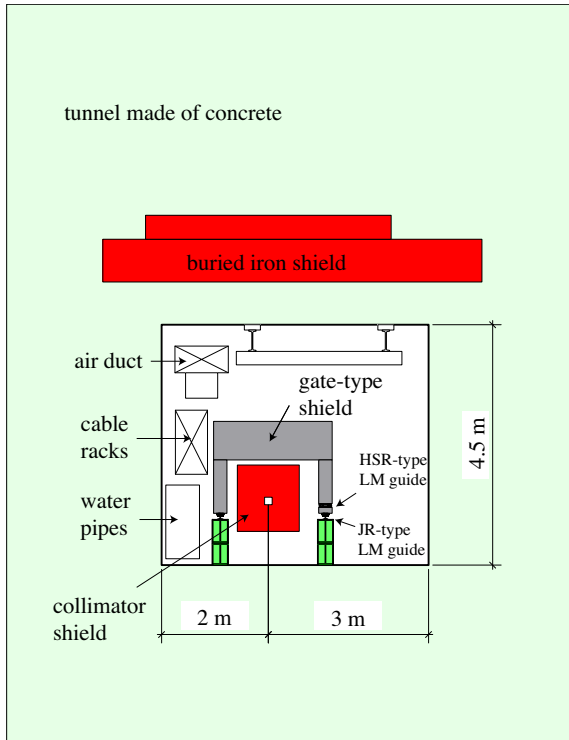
A sectioned drawing of 3-50BT tunnel from the upstream point.
